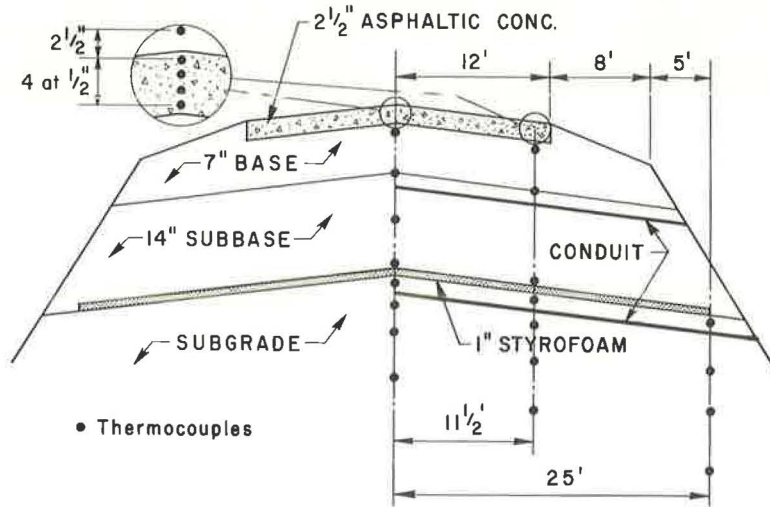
Instrumentation and cross-section of section 2, Midland, Mich.
